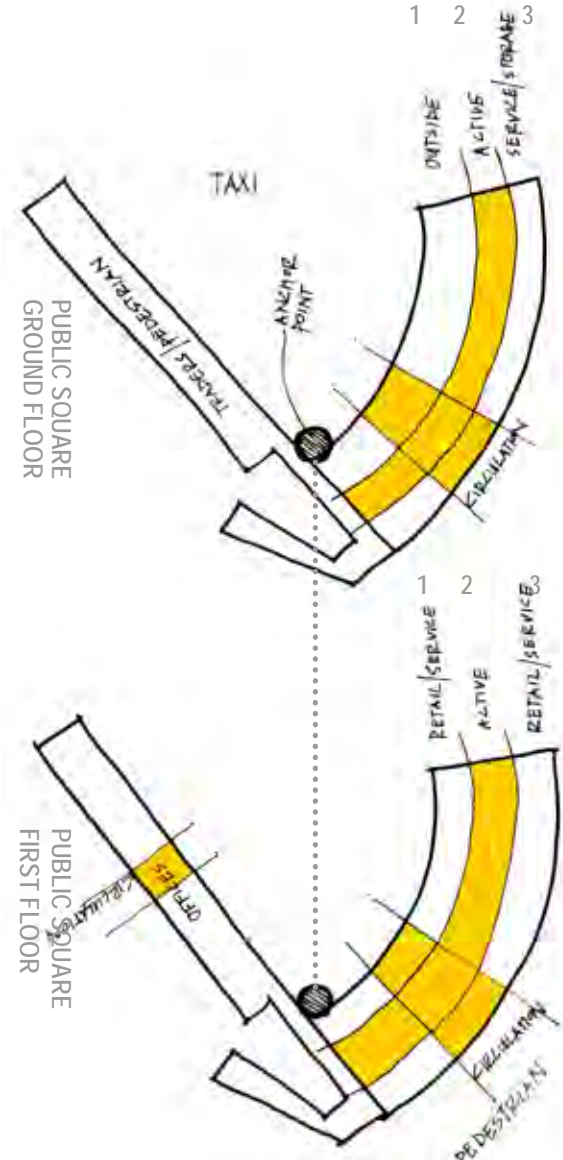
TAXI TRANSIT PARK DIAGRAM PLAN
